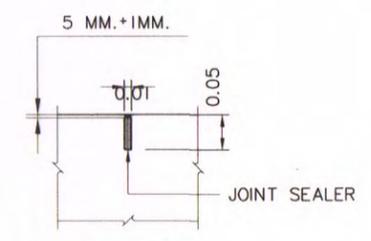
DETAIL OF CONTRACTION JOINT FOR R.C. SLAB DETAIL
